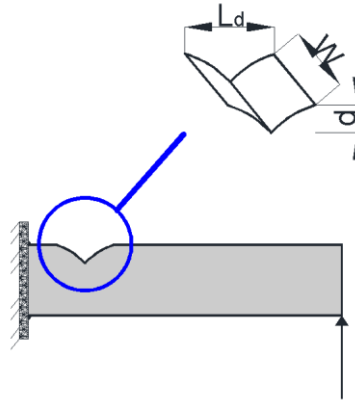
Position and geometry of the dent on the compression side of the specimens.
